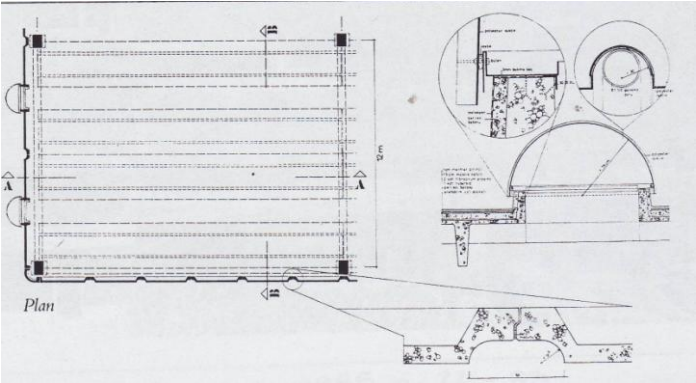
Lassa Tyre Factory, technical details of the precast wall panel system. (Mimar, 1985).
